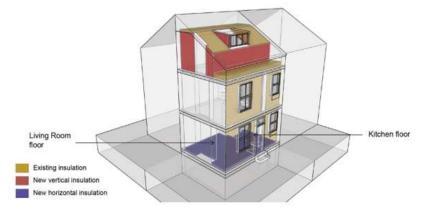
Stage 3: Floor retrofit to Kitchen and Living Room, (17BG.A.R.F)
